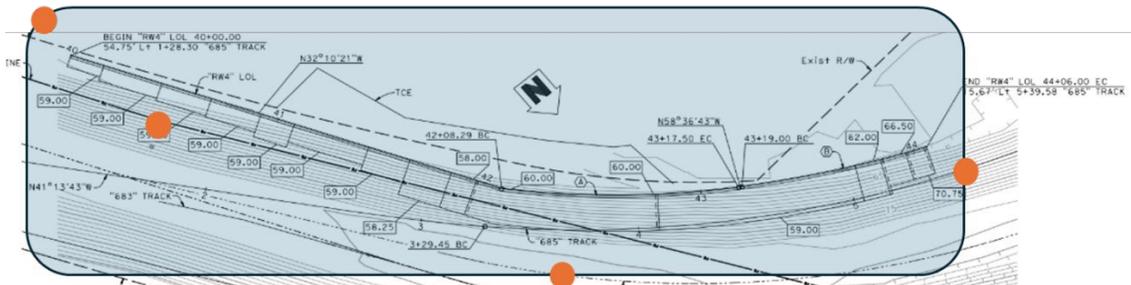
"Bounding the Structure" – Retaining Wall Idealized
